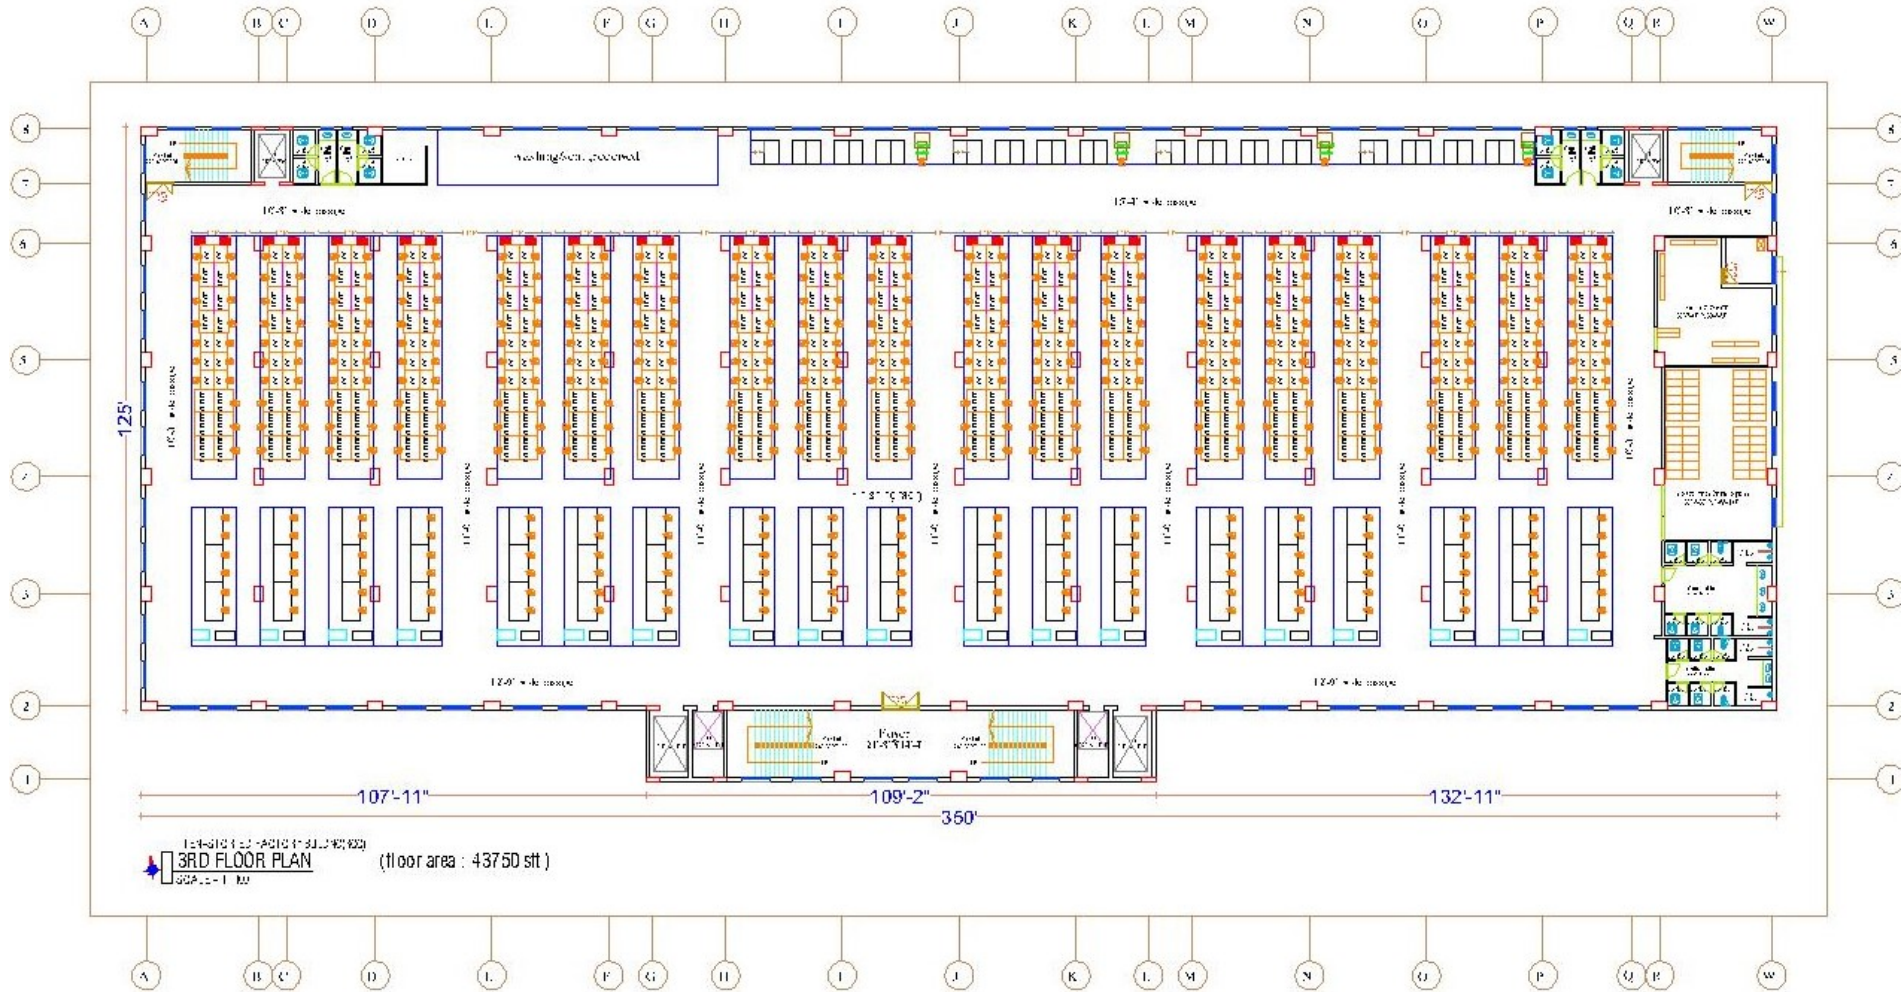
A typical plan view of 2nd & 3rd Floor
